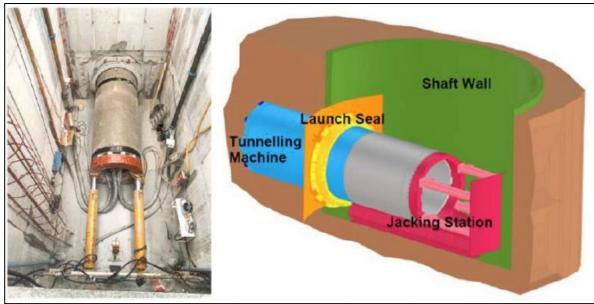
Example of thrust shaft and pipe jacking system for constructing pipeline tunnels (PRDW, 2016).
